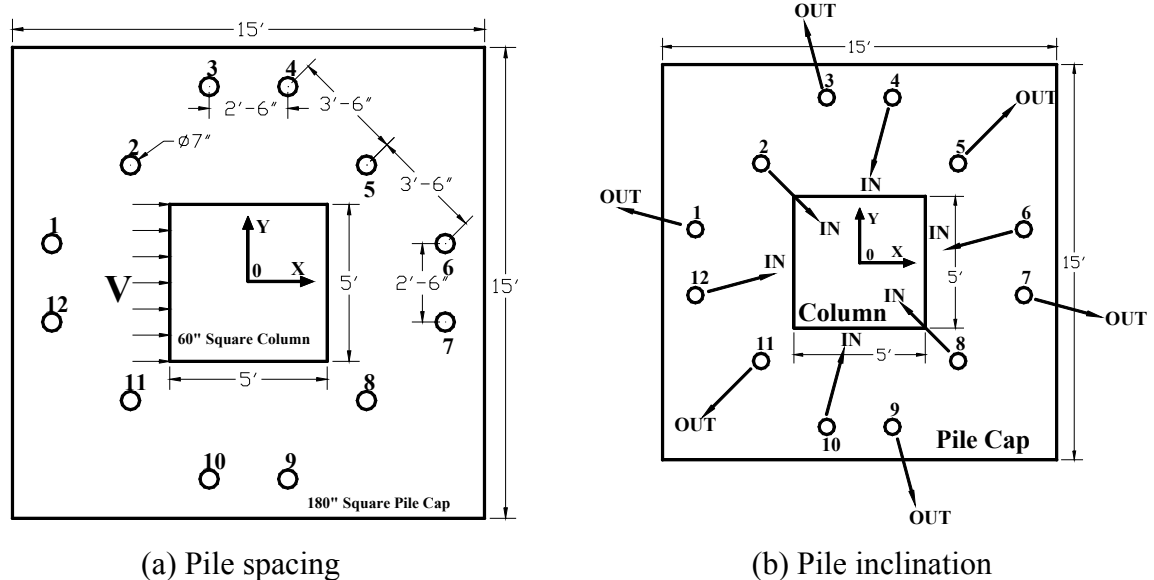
Plan View of the Micropile Foundation (after Trinh et al., 2004).
